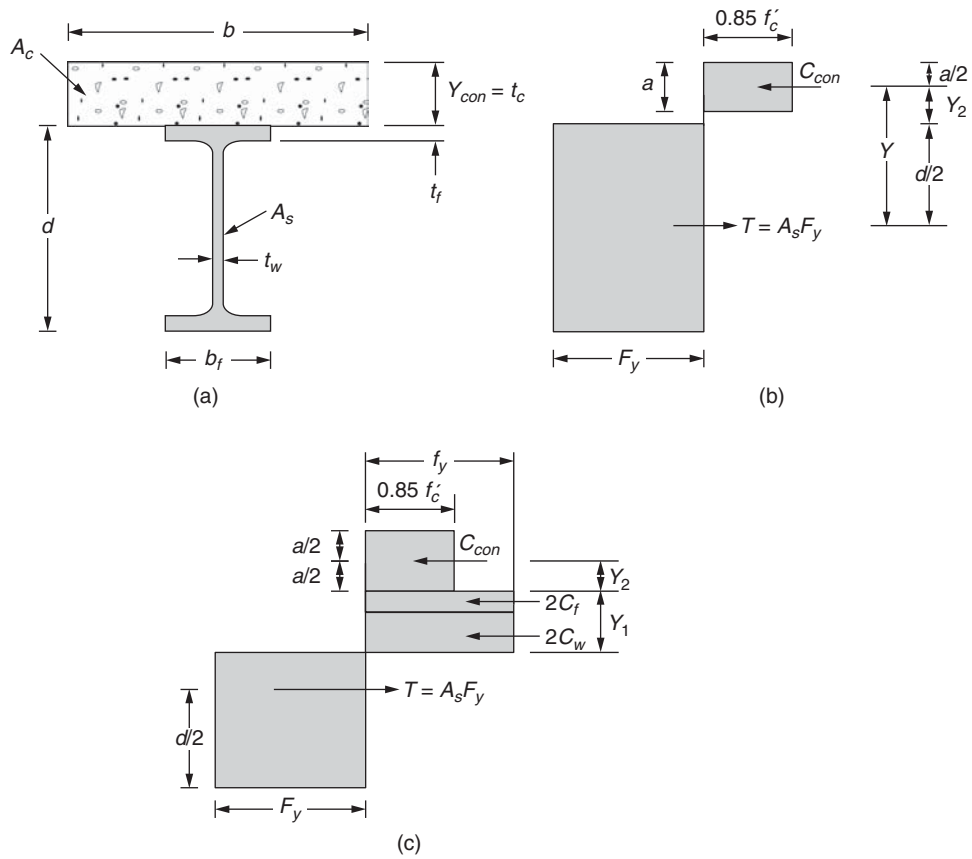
Fully composite beam with flat soffit concrete slab.
